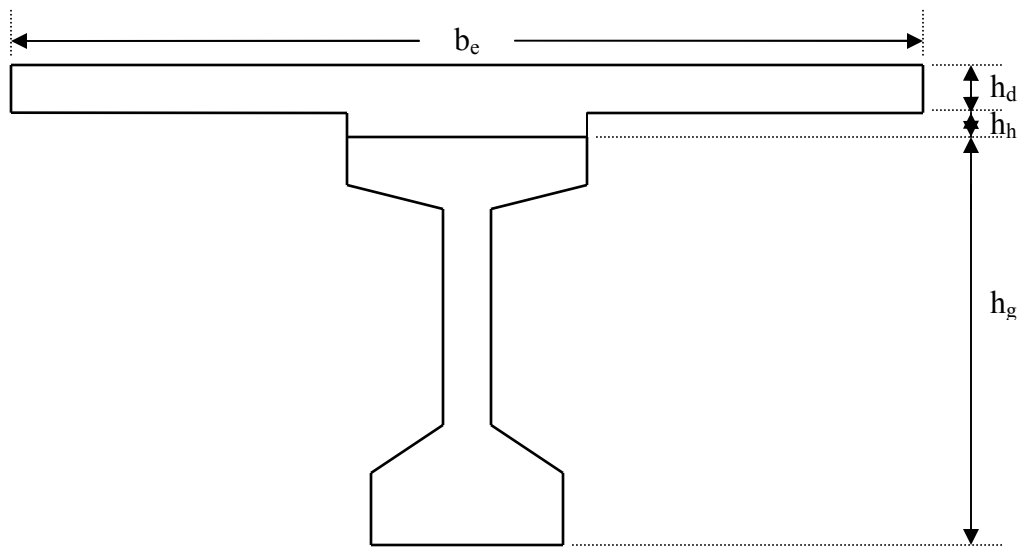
Sketch of PCBT Girder with Deck and Haunch
